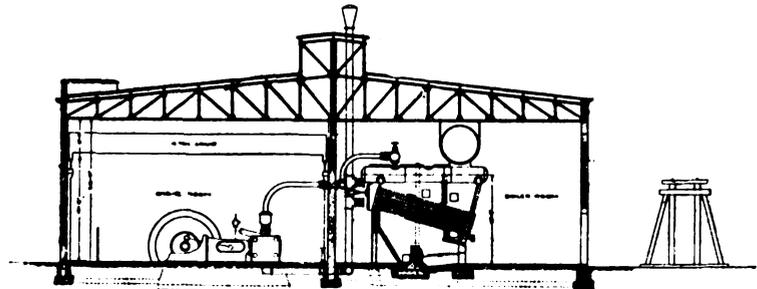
SECTIONAL VIEW OF PROPOSED PLANT.
